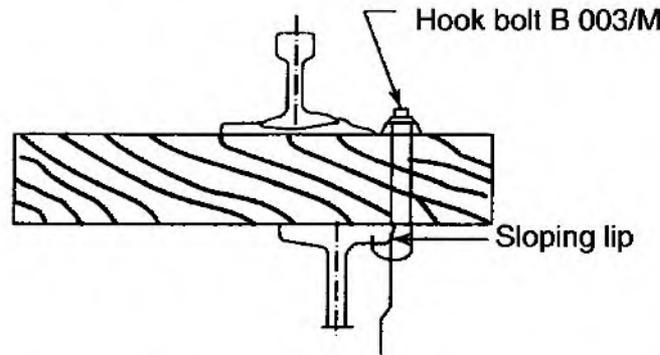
Method of fastening wooden sleepers on joist spans
